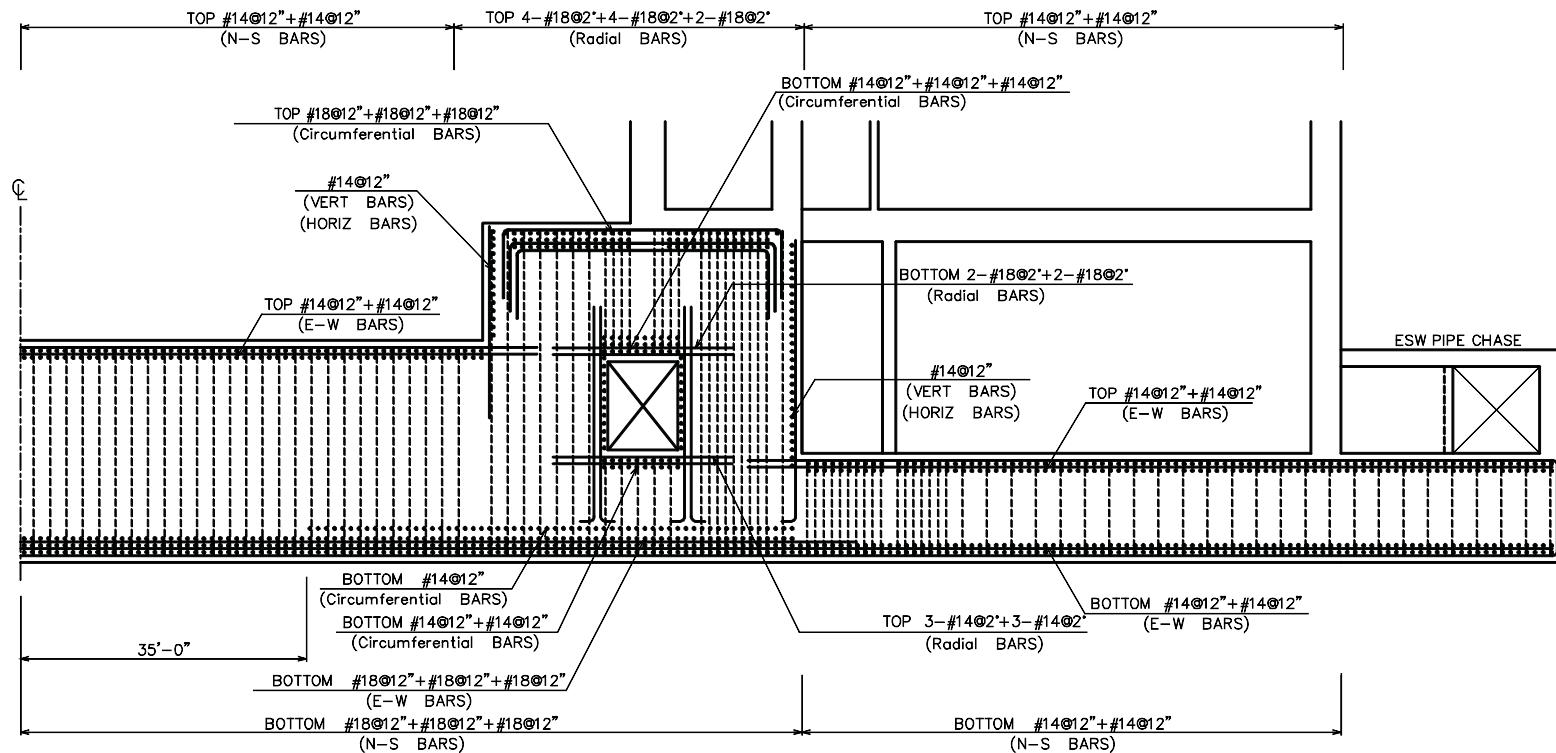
Reinforcing Steel of Basemat: SECTION N-S
